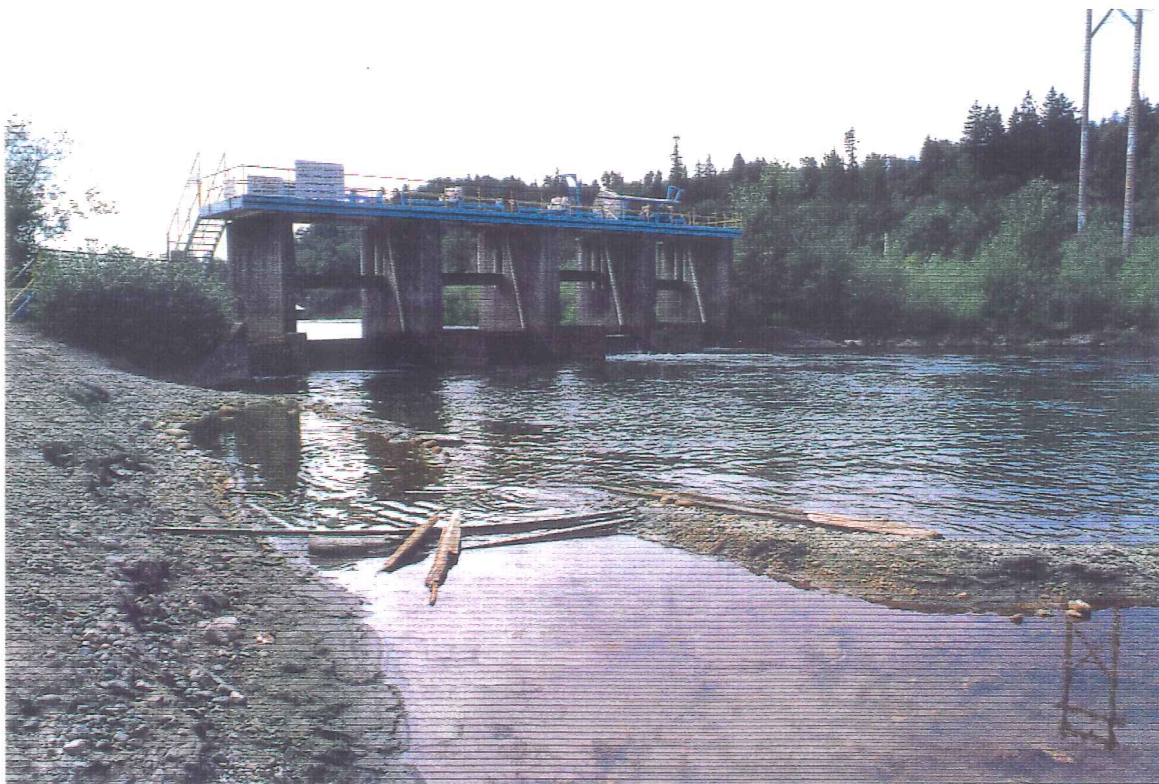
Looking upstream toward the spill gate structure with the Lake level near the existing full storage elevation.
